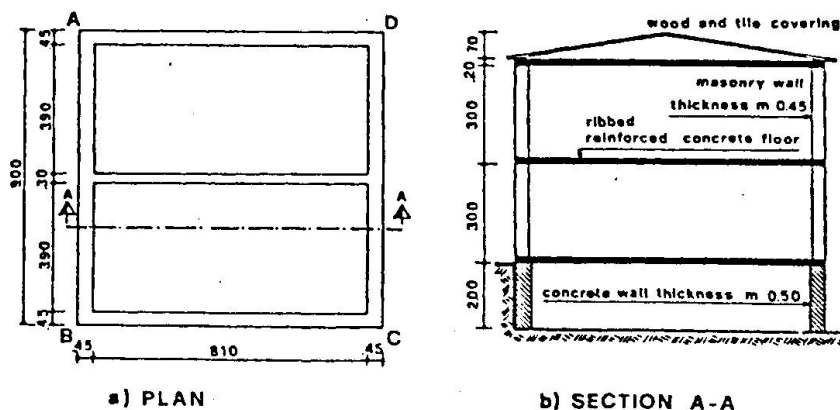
Structural scheme of the house near the Ambiesta dam.
